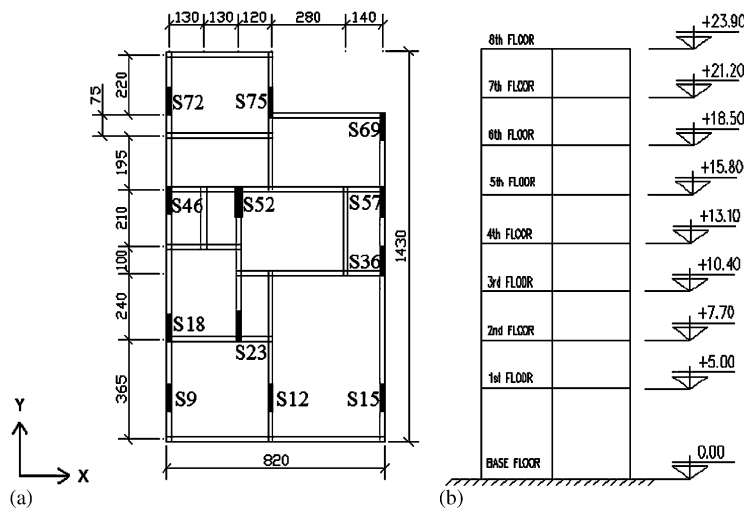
Eight-storey building: (a) plan view (cm) and (b) lateral view (m).
